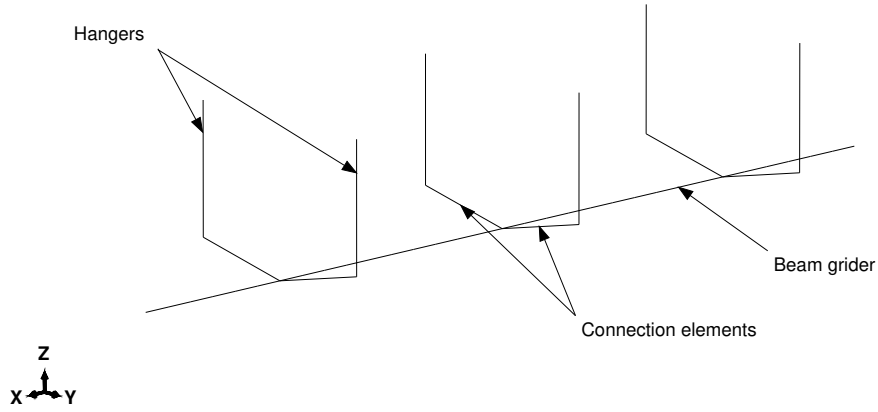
The spine-beam approach replaces the box girder with beam and connection elements.
